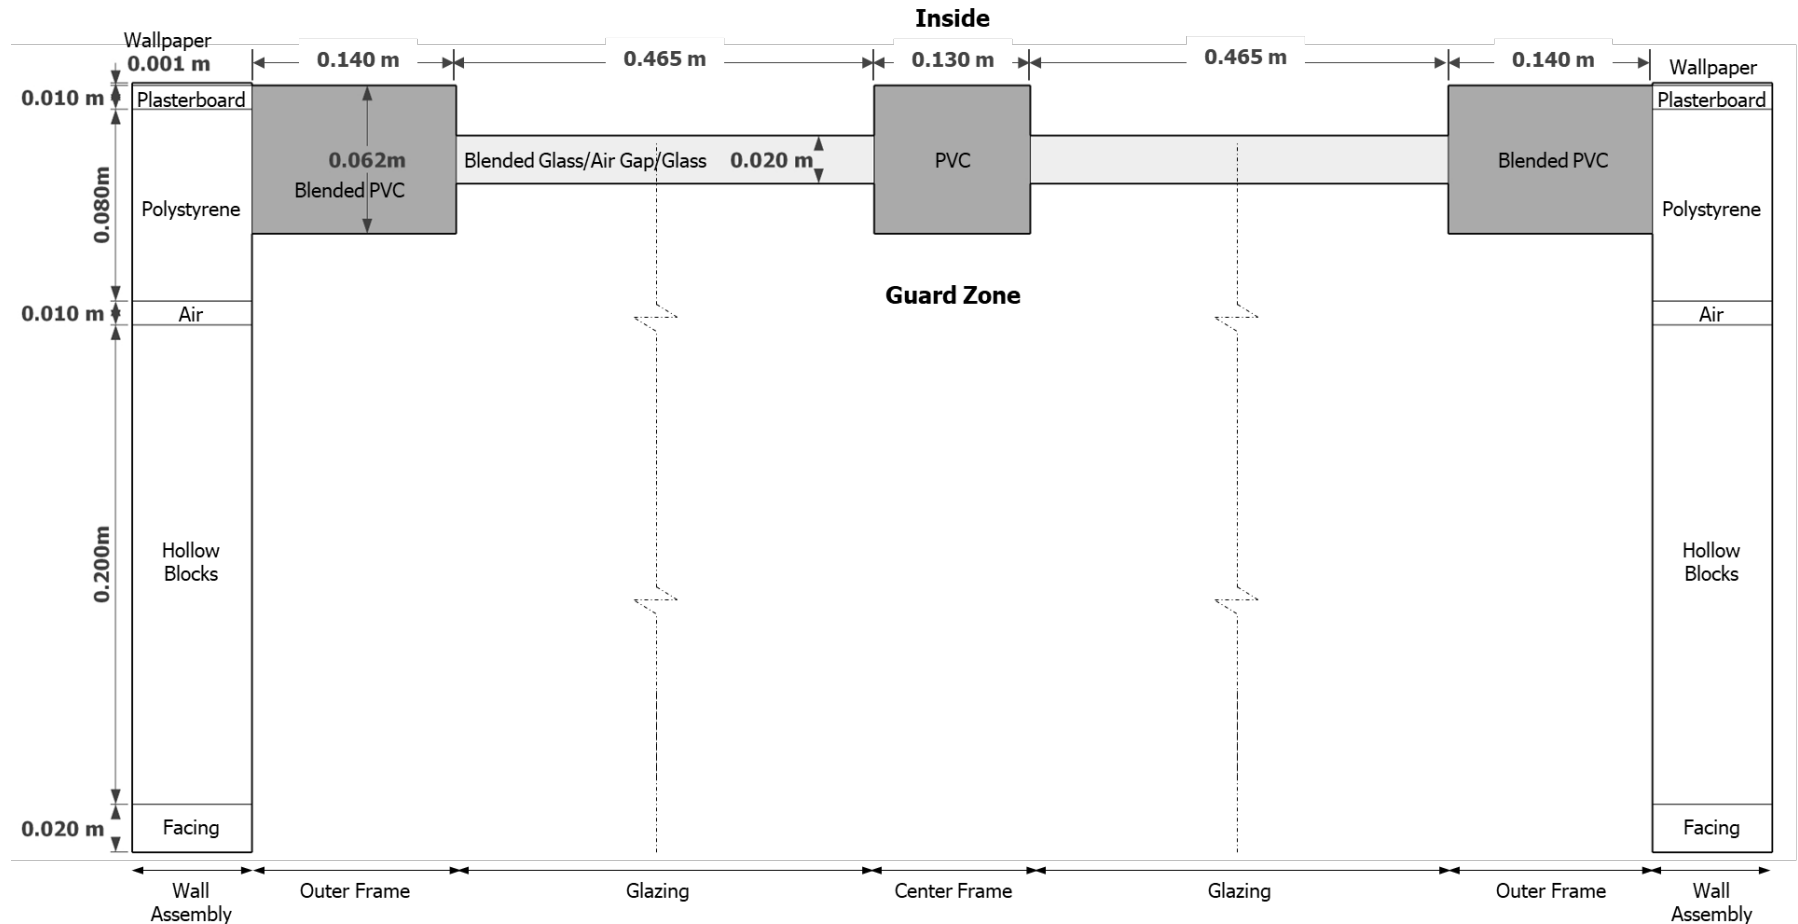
Window Vertical Section (window and frame assembly), through the window and external setback cavity looking downward (or upward) – NOT TO SCALE
